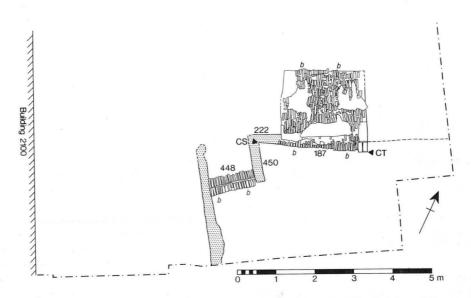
Phase III2 (east). Building 3132. Basement plan showing the roof of Vault 187 and Steps 448. Scale 1:100.
